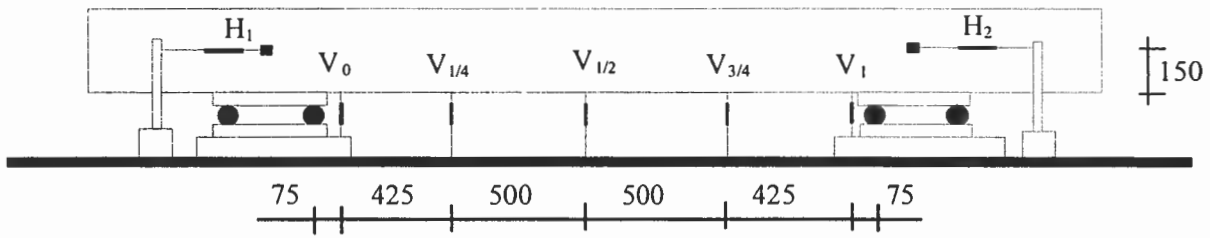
The position of displacement transducers placed between plain concrete test beam and counter beams (measurements in mm).
